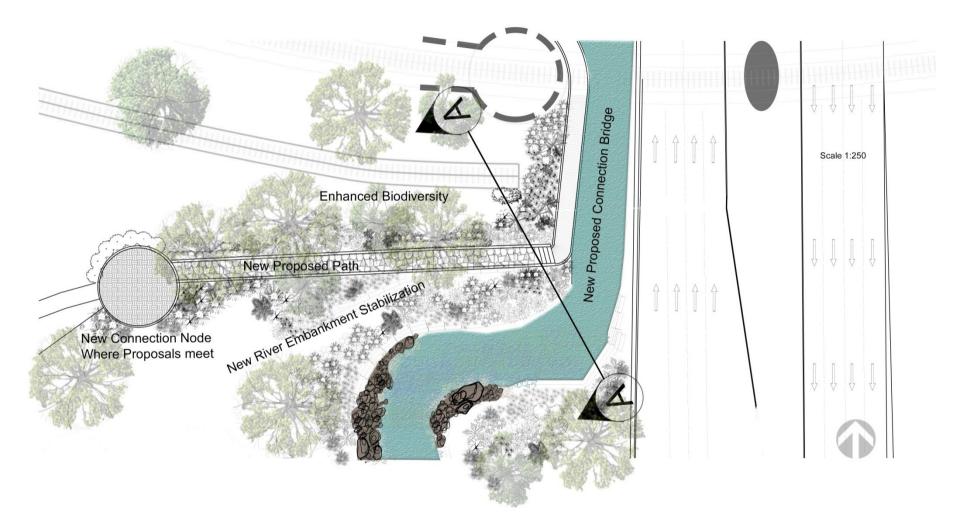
Plan of Scenarios 1\_River Embankment Stabilization (Author 2014)
